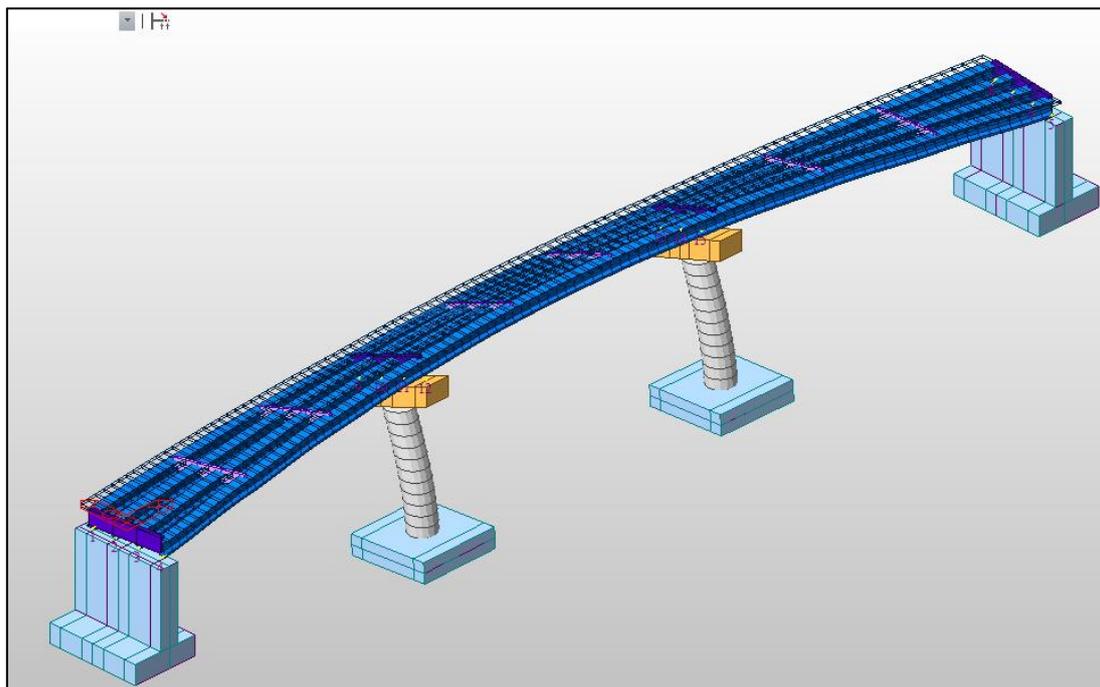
Fundamental Period of Conventional Model Bridge
